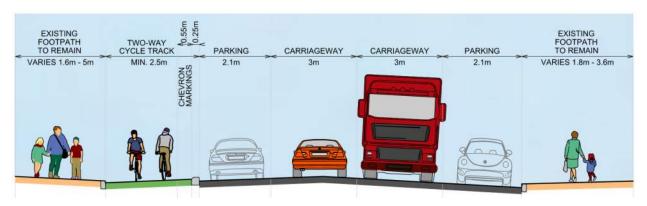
Typical Section 5 Option B Cross Section Henry St - Two Way Cycle Track
